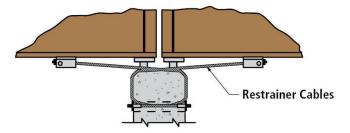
Longitudinal Restrainer of Steel Girders with Connection to Substructure
